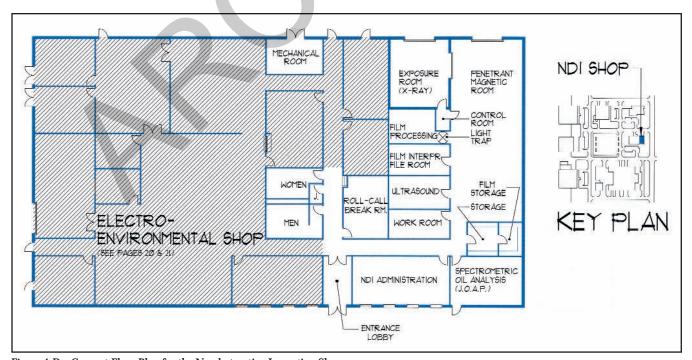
D: Concept Floor Plan for the Nondestructive Inspection Shop.
